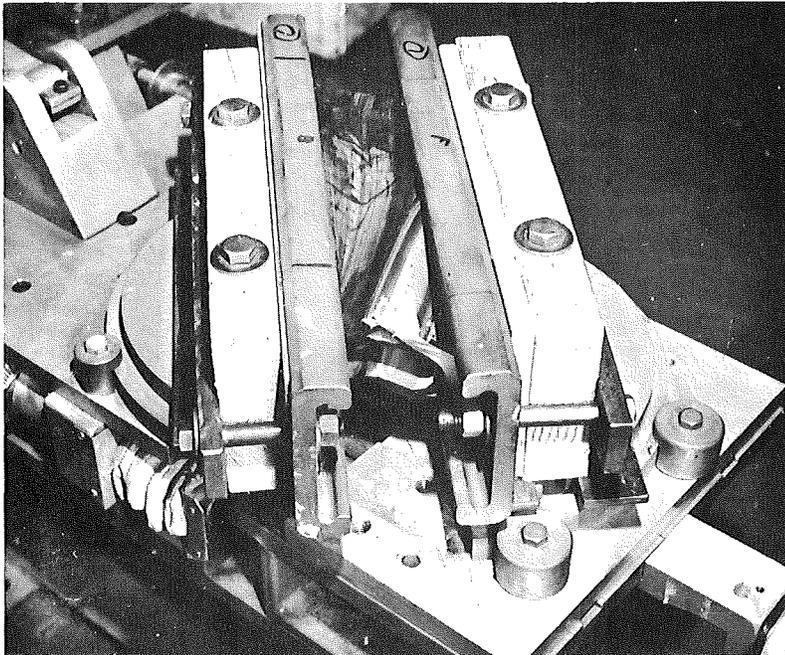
Seal mounted with standard specification lubricant-adhesive started to pull out of steel extrusions after 850 cycles in tension.
